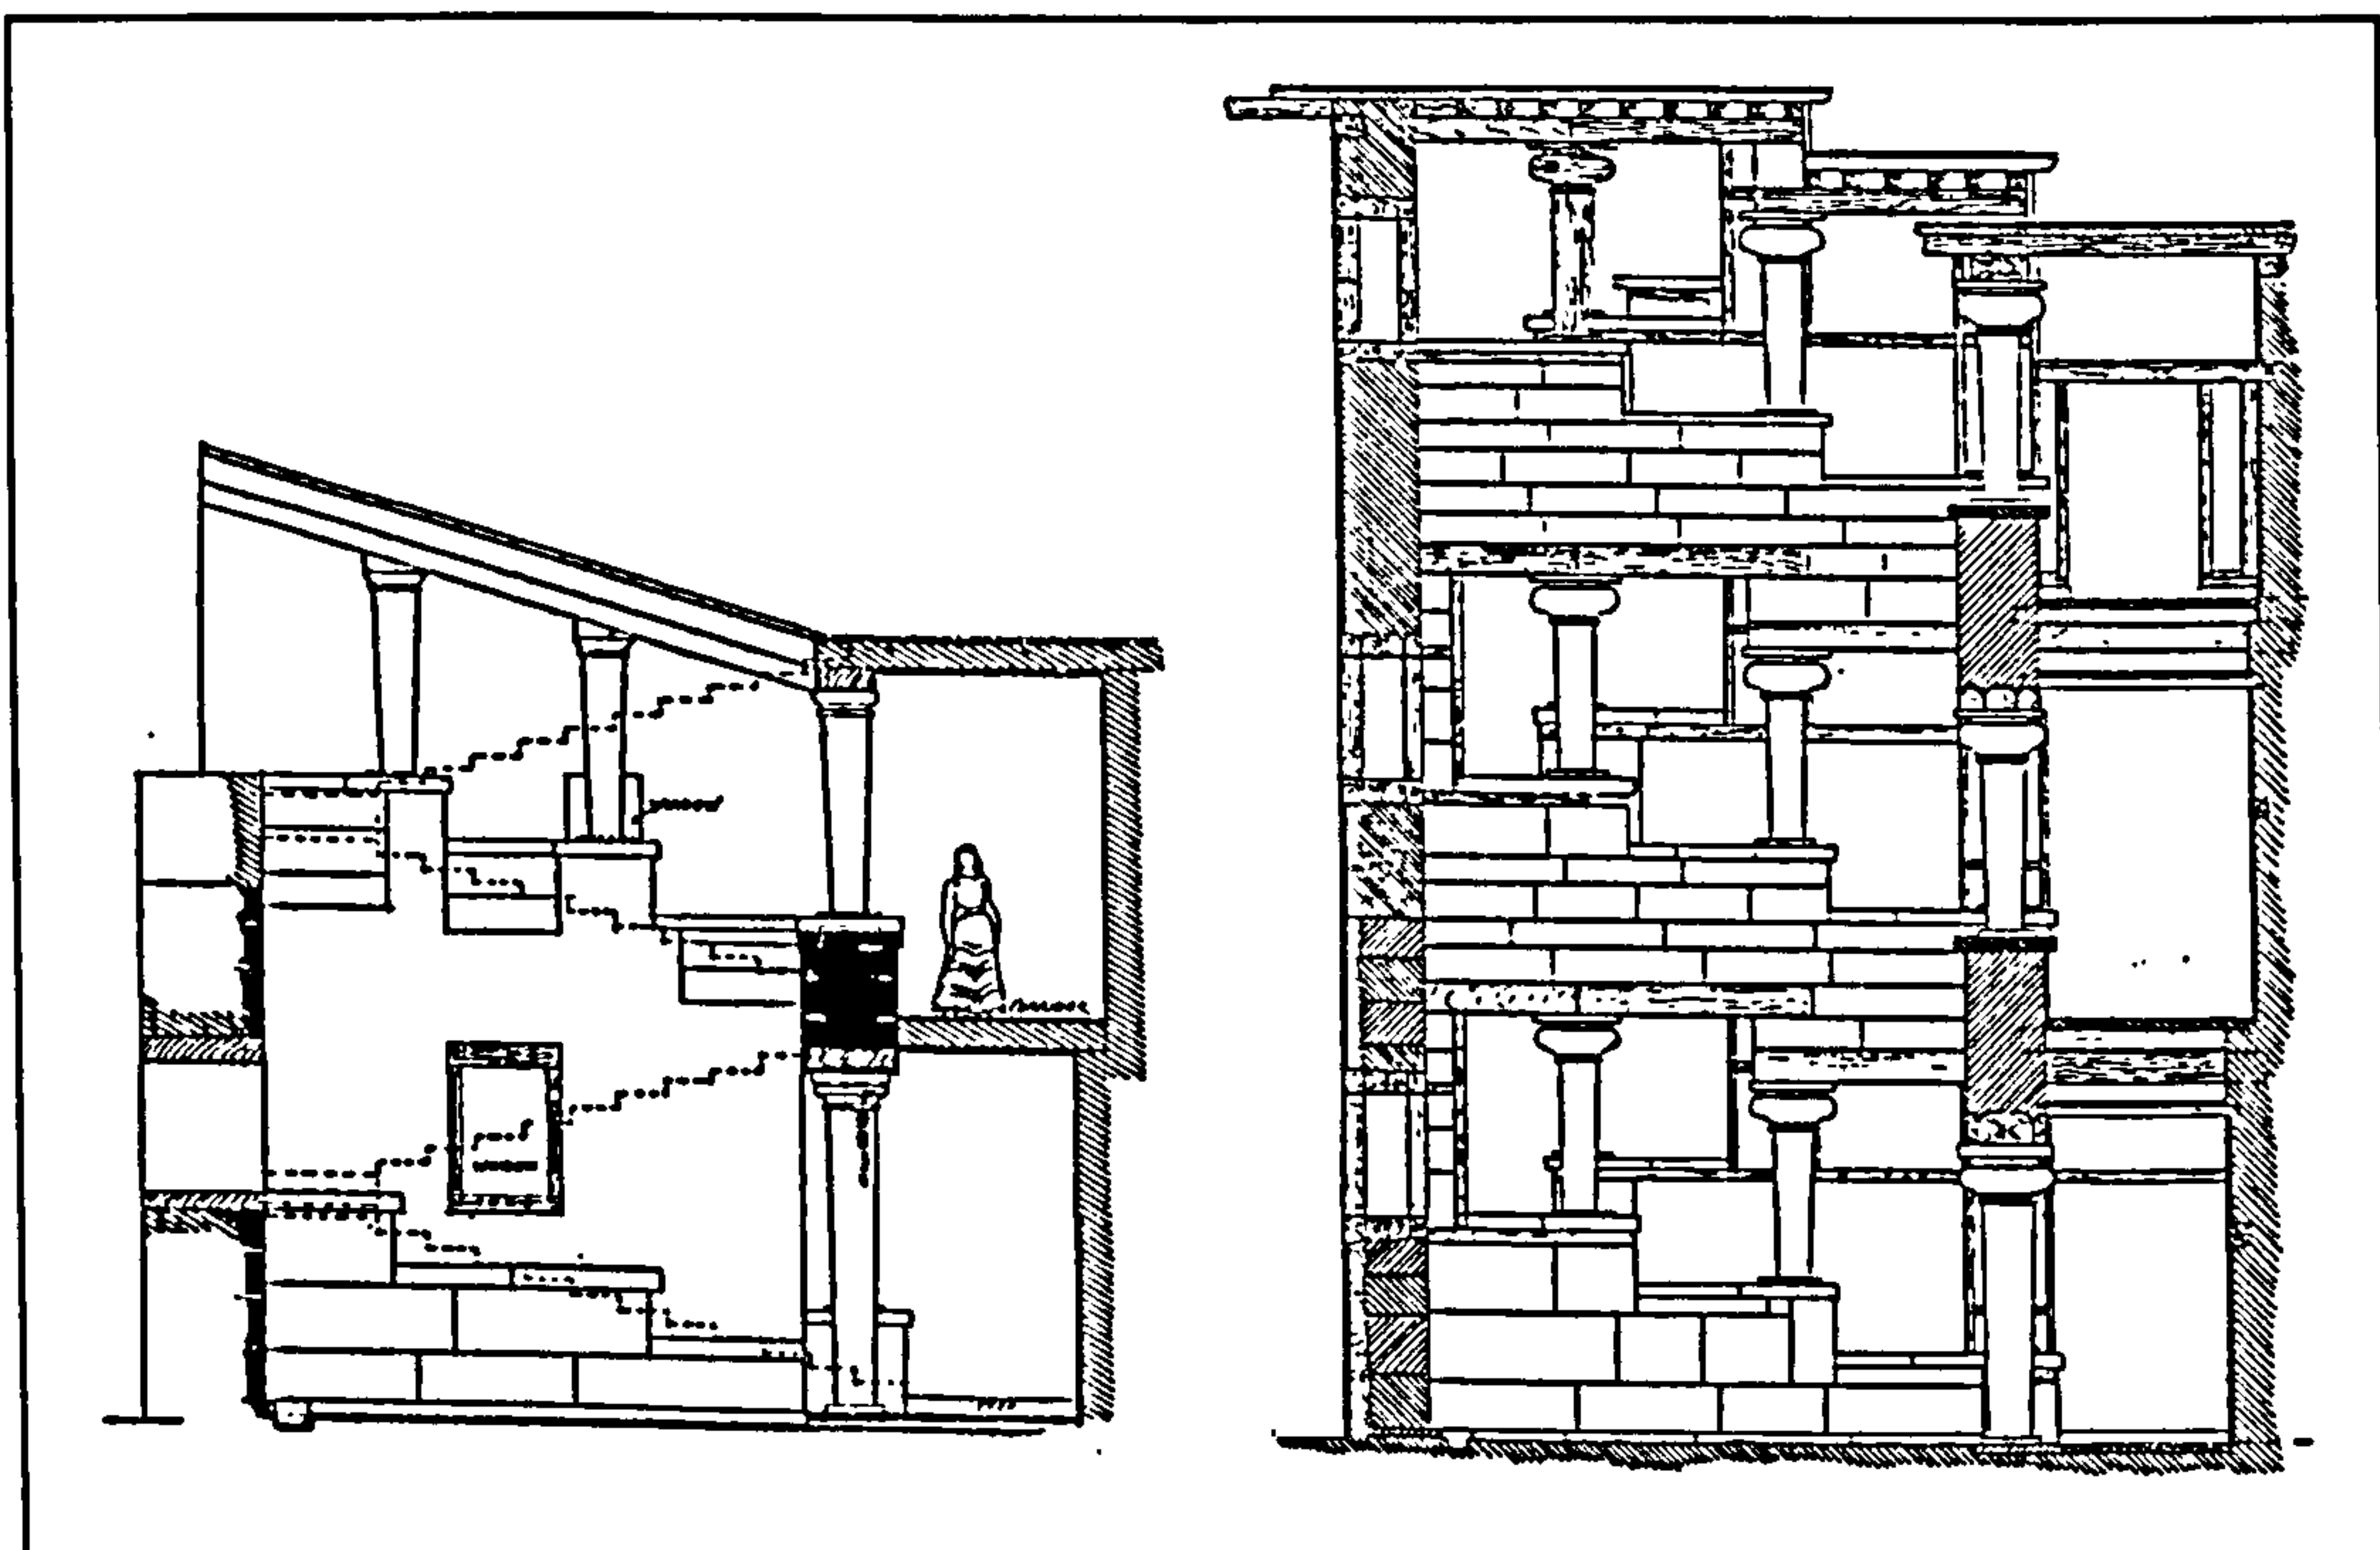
Grand Staircase elevation looking west by Fyfe, 1901 (left) and Doll, 1905 (right).
